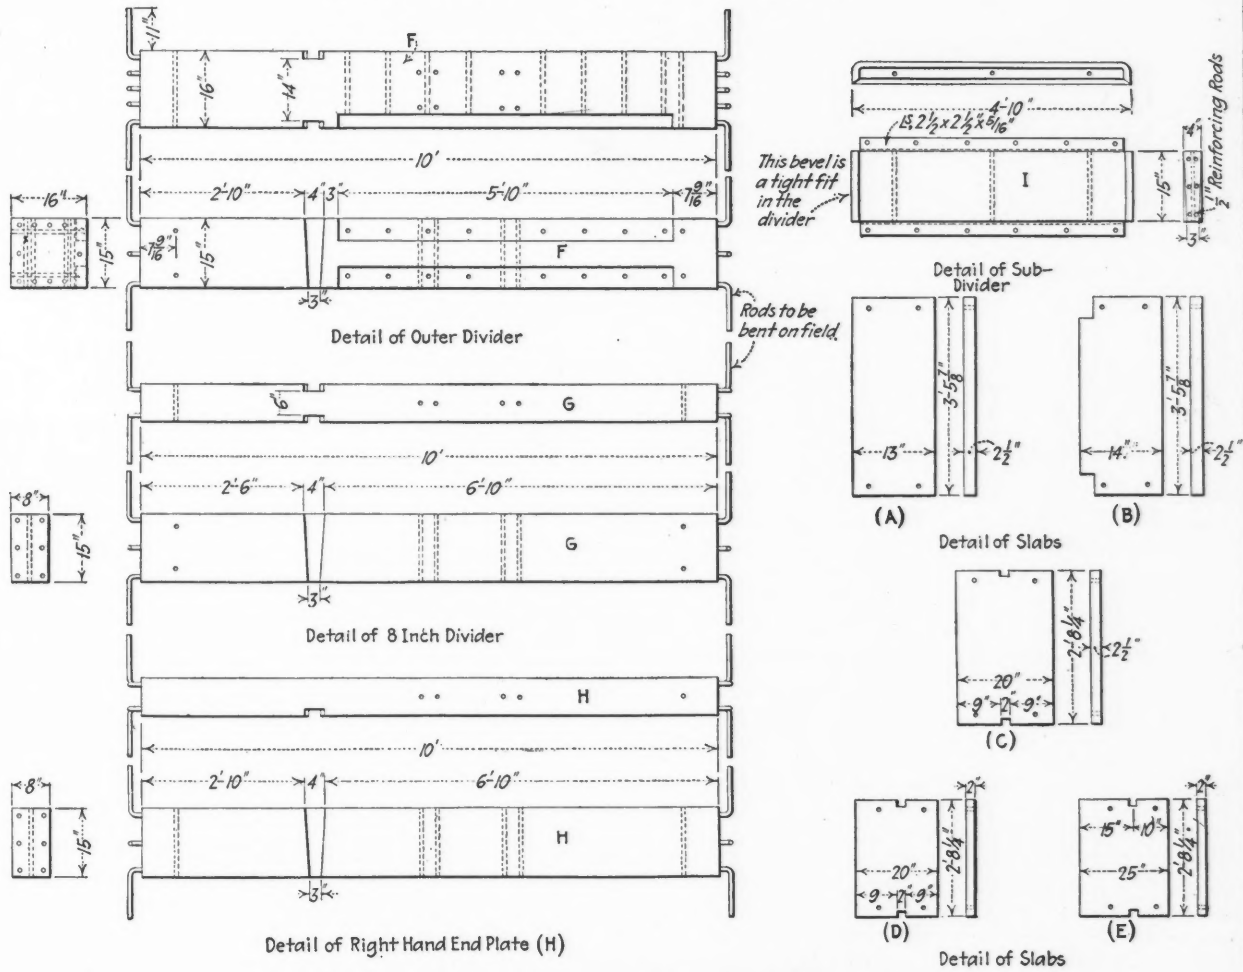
DETAIL OF CONCRETE DIVIDERS AND SLABS
